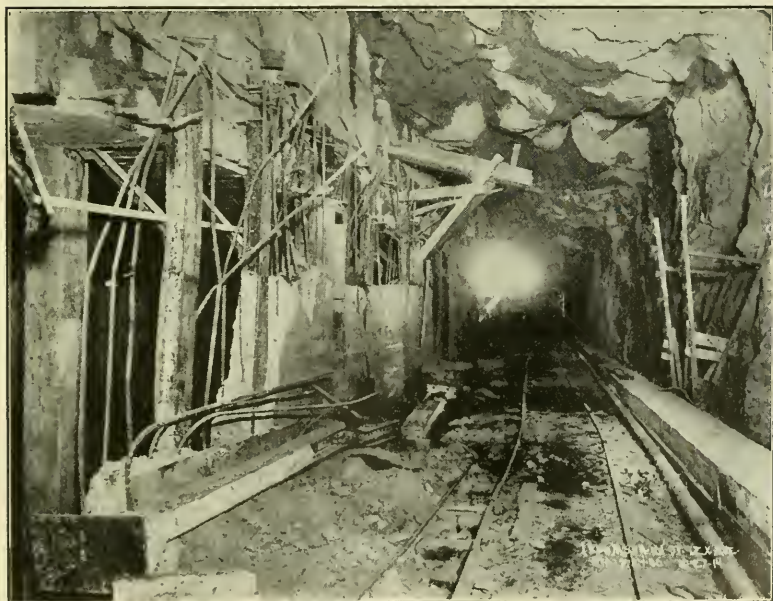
SUBWAY STRUCTURE DAMAGED BY BLASTING.
